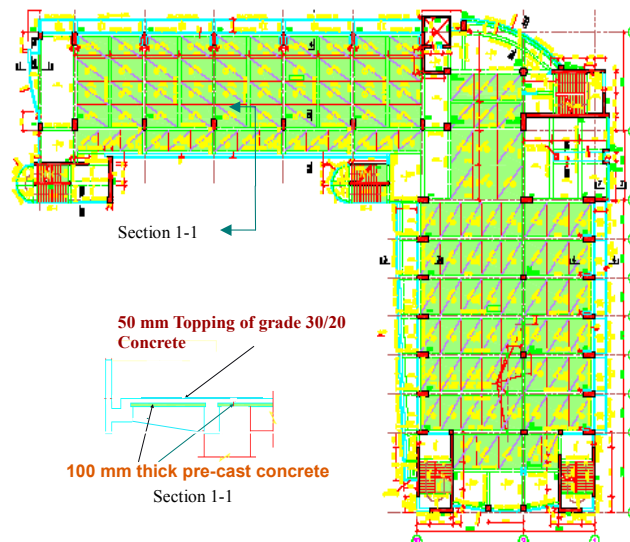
Typical Floor Layout and Semi Pre-cast Slab Arrangement
